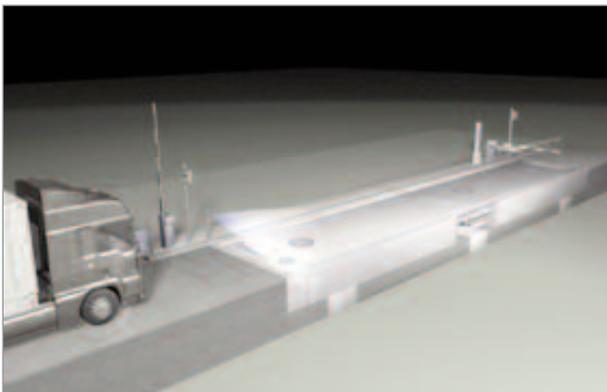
A pit mounted scale placed in an excavated foundation flush with the ground
